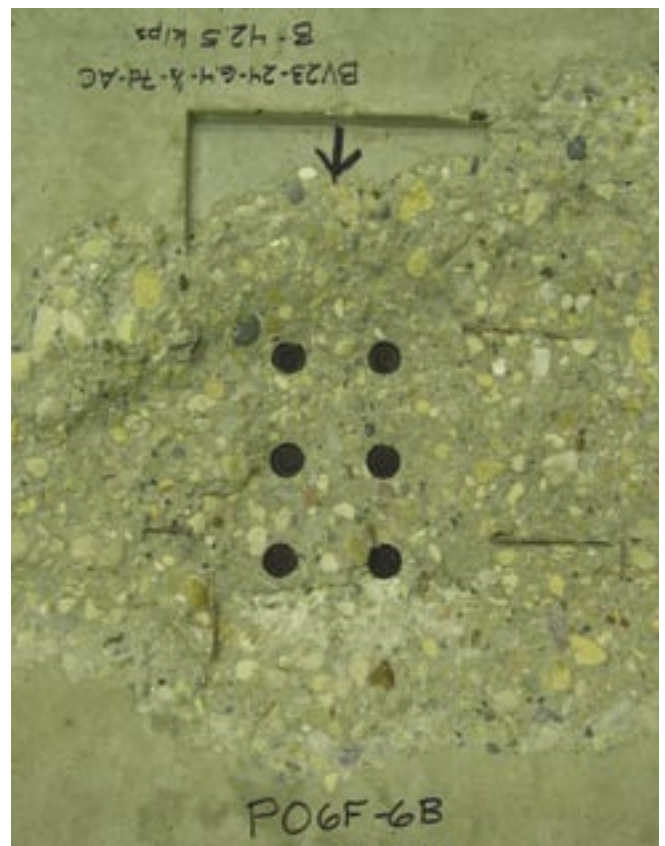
Breakout plan of six stud Test PO6F-6B with $y = 3$ in. and $Y = 6$ in. (76 and 152 mm).
